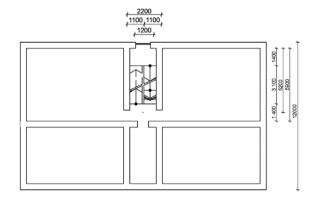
Layout of a fragment of the staircase of a nine story brick house of Π-29 series
